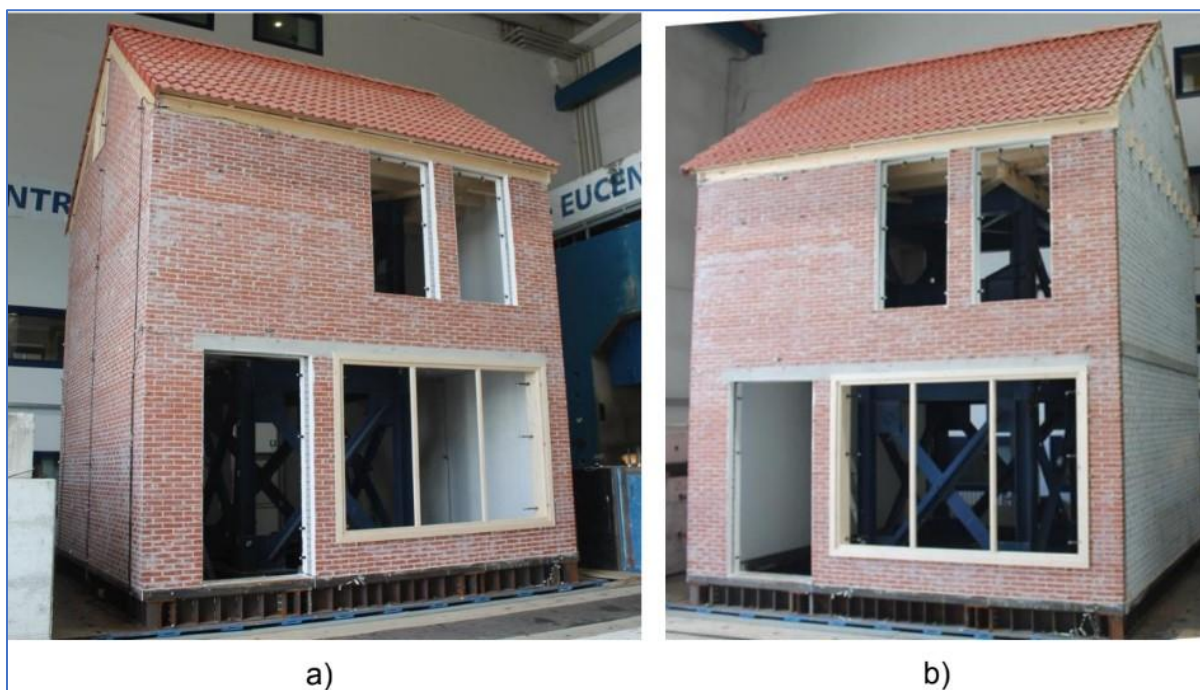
Completed prototype: a) North and West façades; b) West and South façades.
